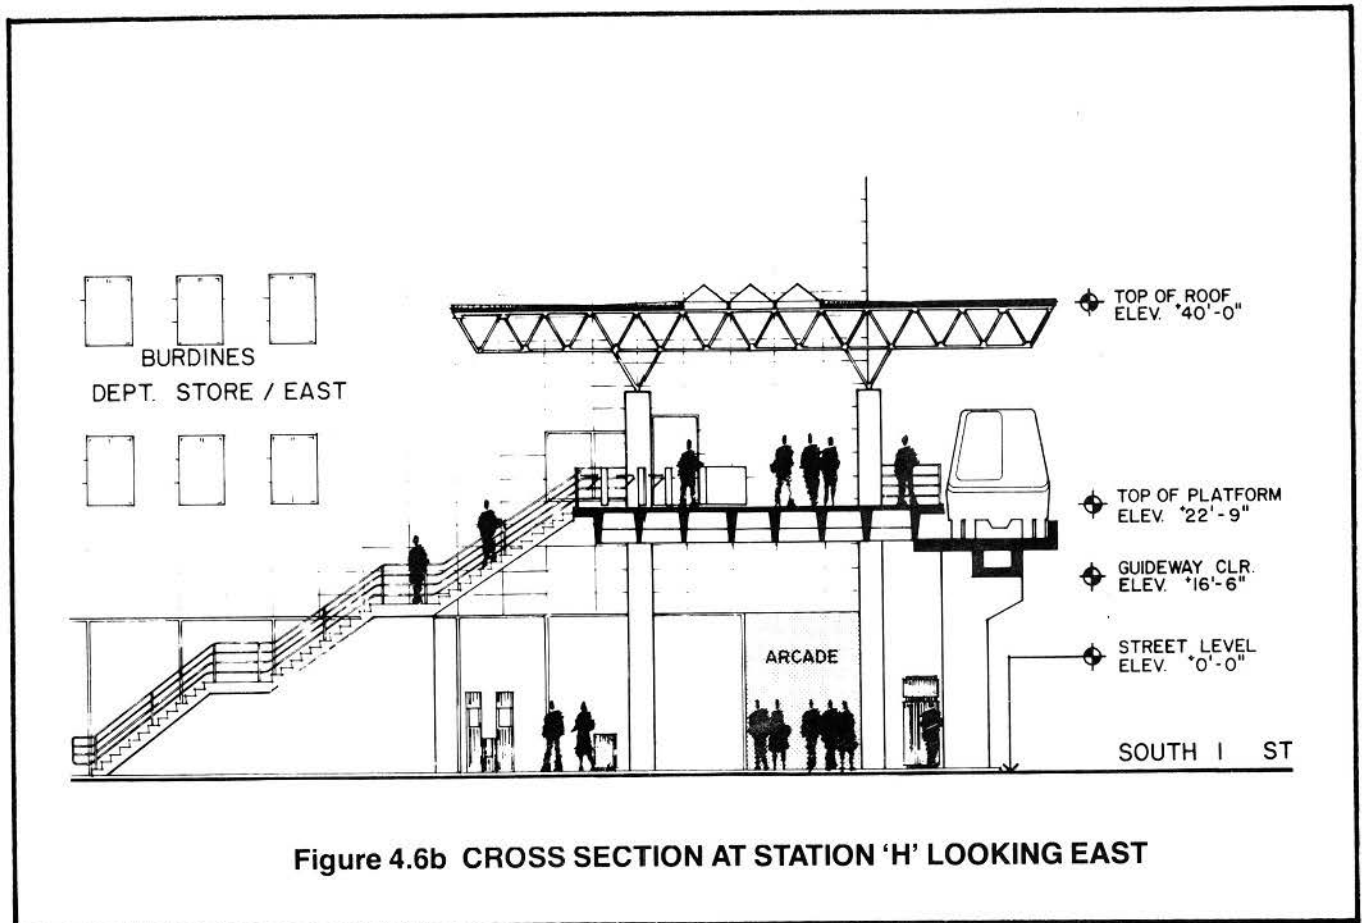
CROSS SECTION AT STATION 'H' LOOKING EAST
